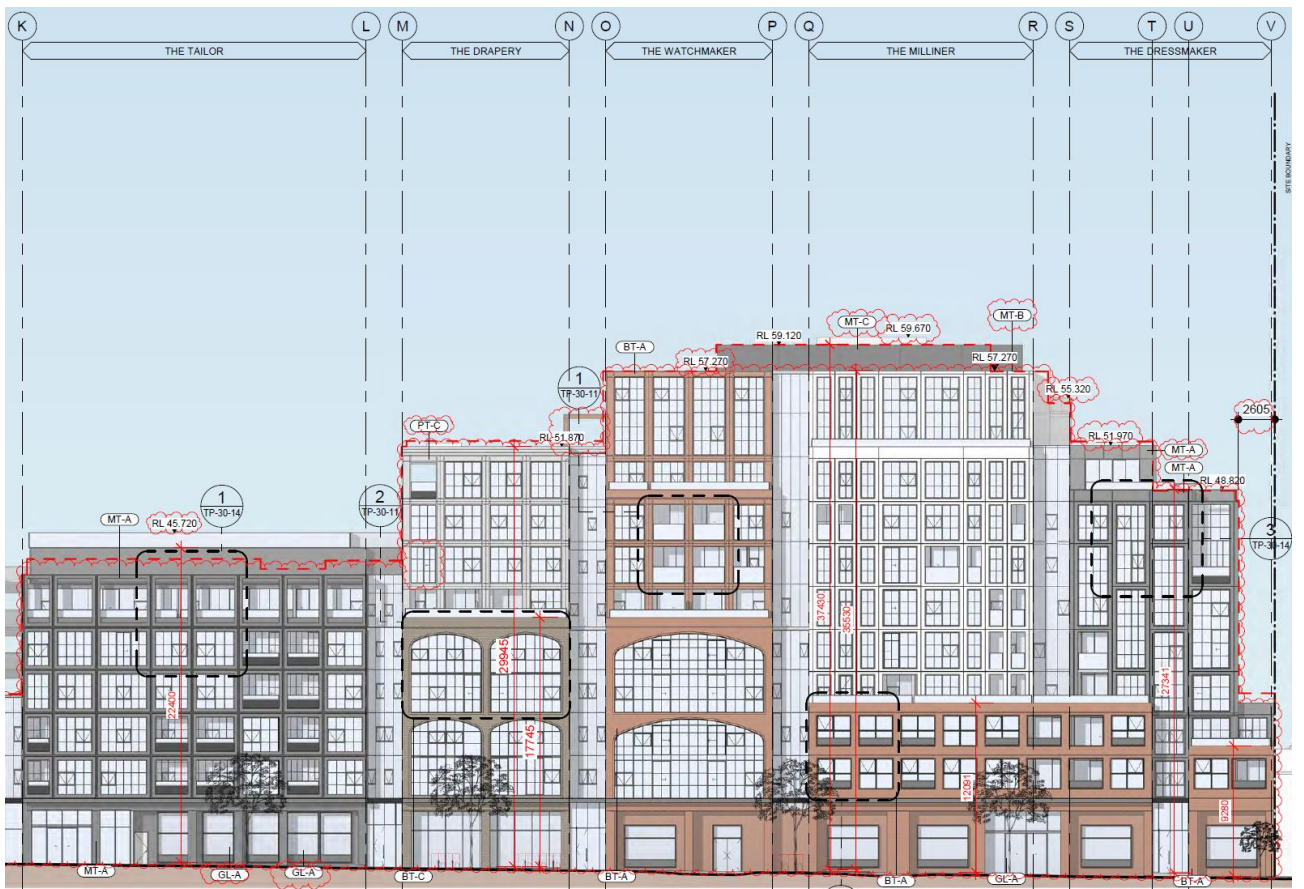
Proposed Wellington St Elevation (Grid K to Grid V)
